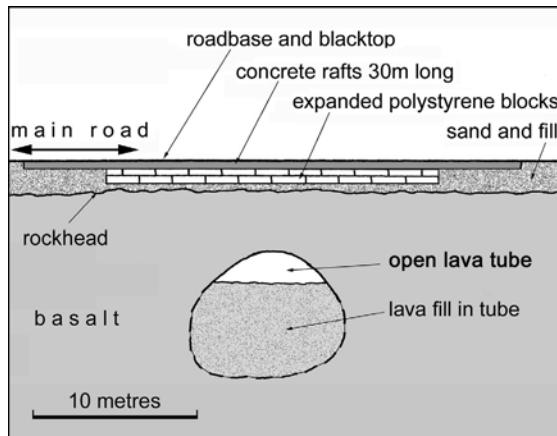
Cross section through the Sung Gul lava tube and the concrete slab that carries the main road above it.
